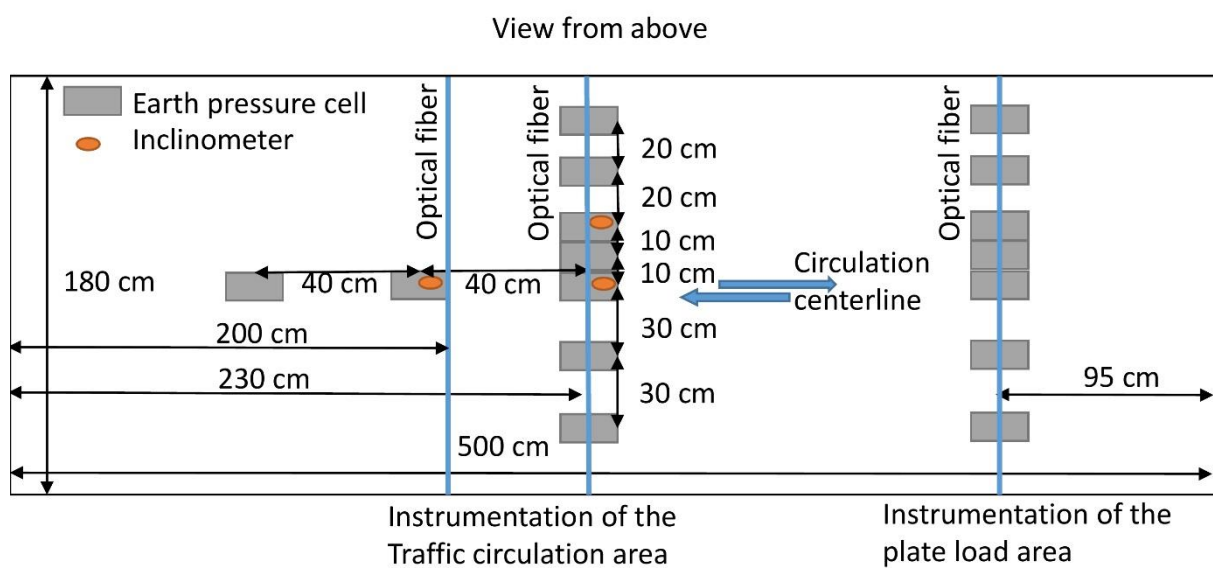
Platform instrumentation plan in the traffic load test, view from above.
